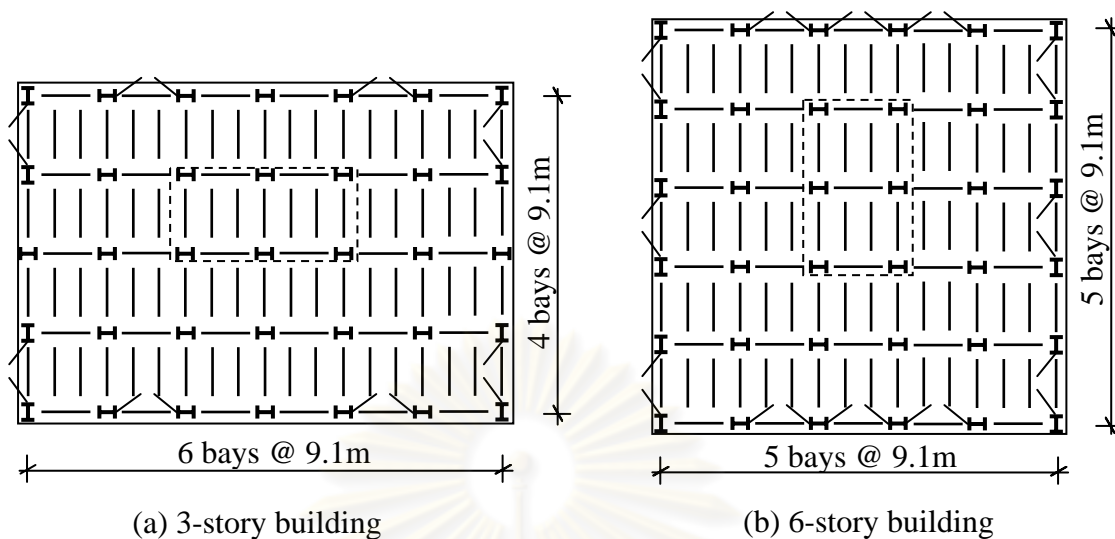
Floor plans of 3- and 6-story BRBF buildings.
